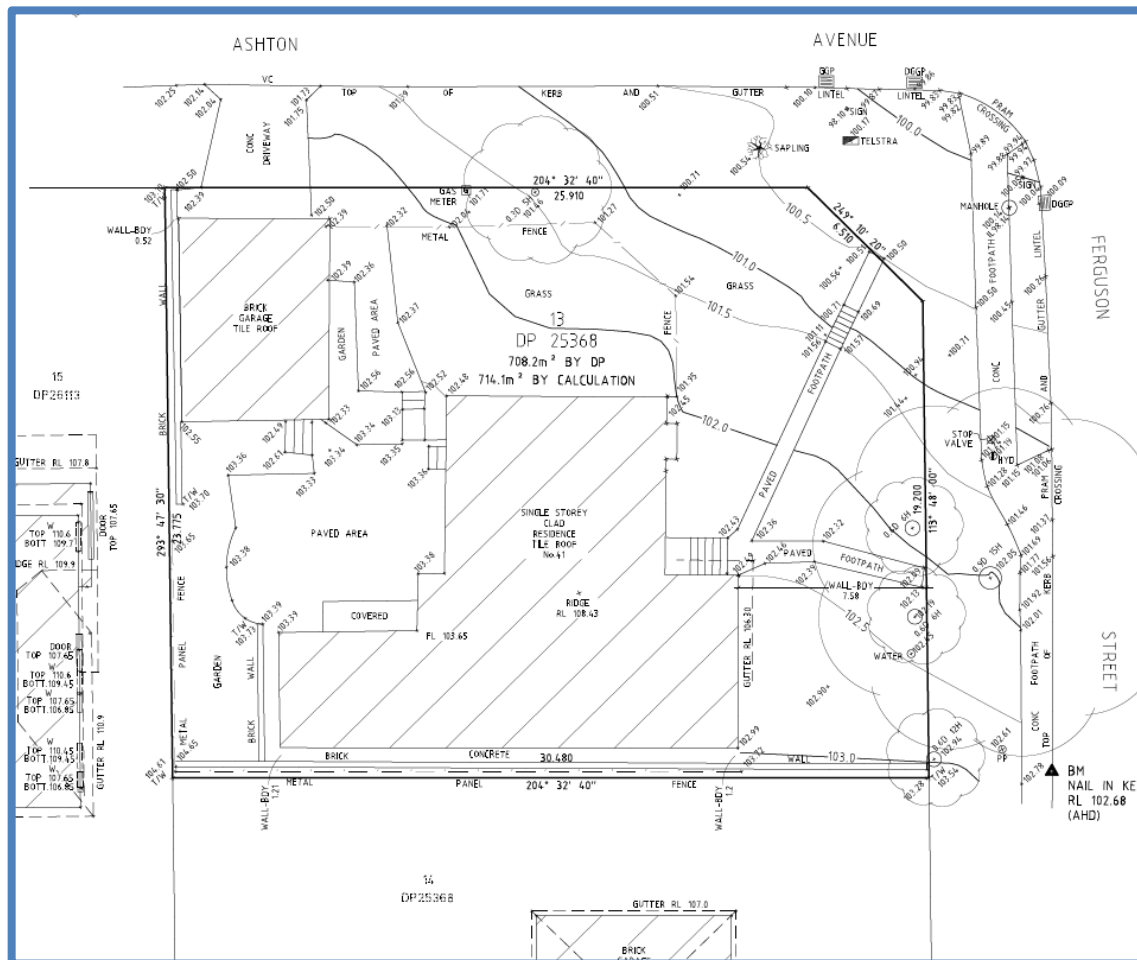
Plan of Survey (Frankham Engineering Surveys).
